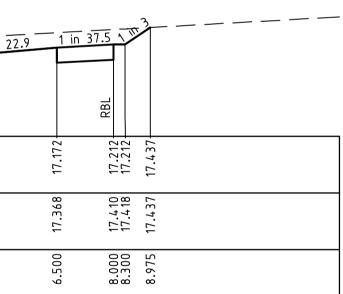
EHL-02A-11 Sheet No. 11 of 23 Rev B
